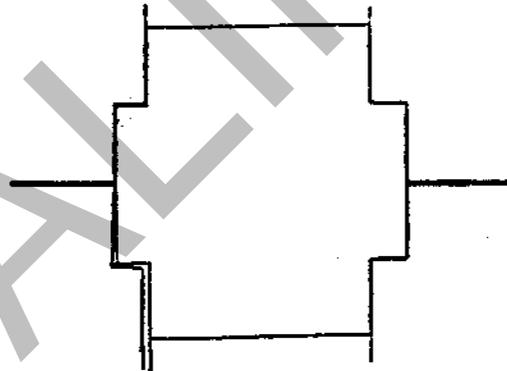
Reinforced Earth Panel- Corner Damage Due to Settlement
